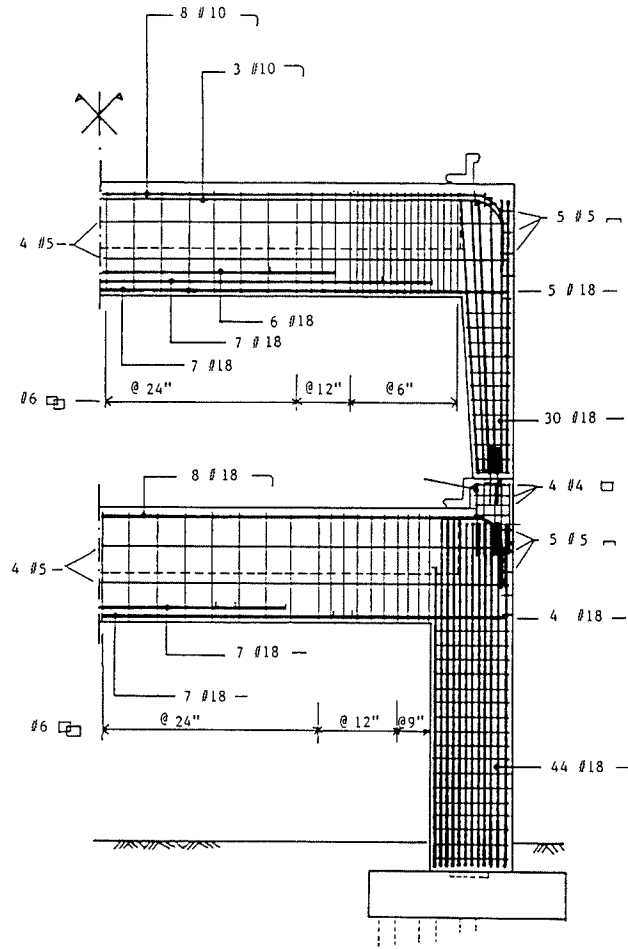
Reinforcement layout for bent Type I<sup>(30)</sup>.
